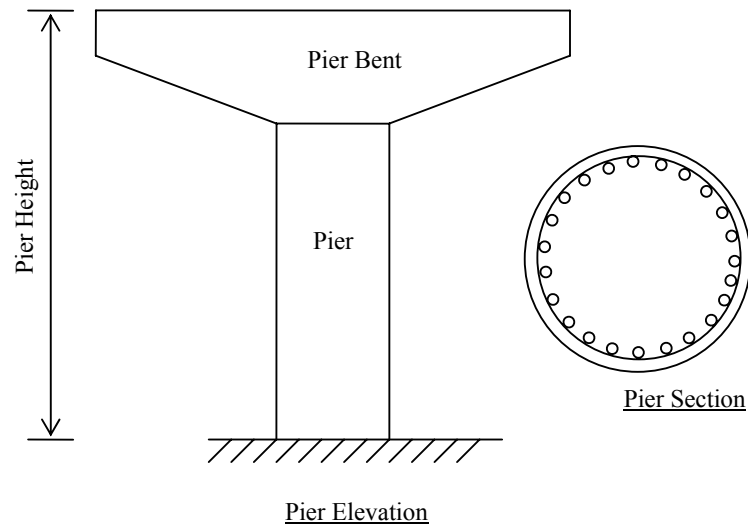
Elevation and Cross-section of a typical pier of Khilgaon flyover
